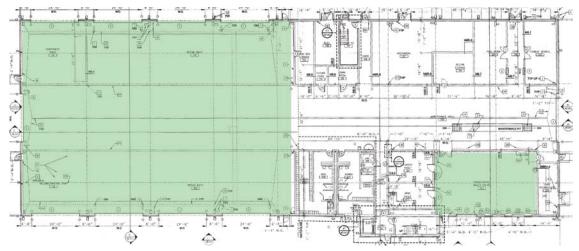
TEMF first floor plan showing regularly occupied spaces.
